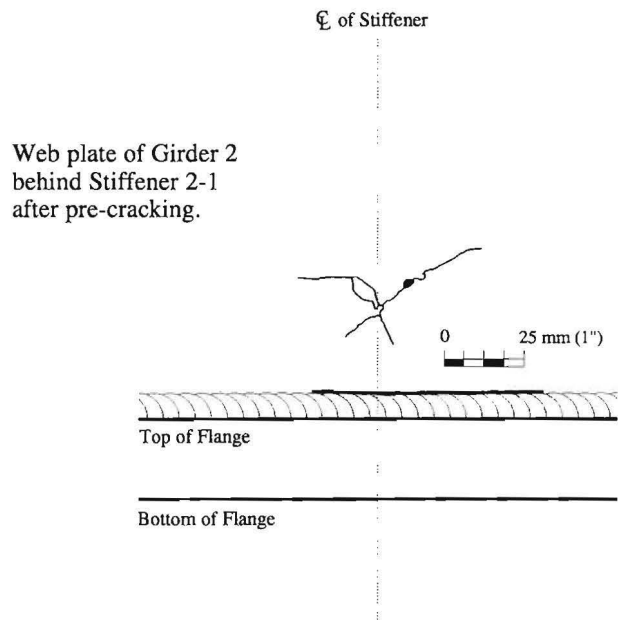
Pre-cracking in web plate of Girder 2 behind Stiffener 1.
